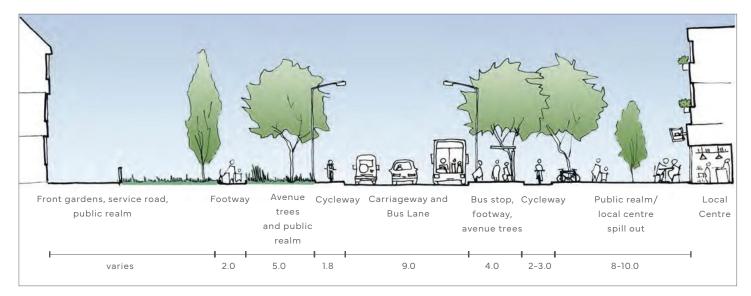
Proposed Oxford Road Section as shown in the Development Brief
